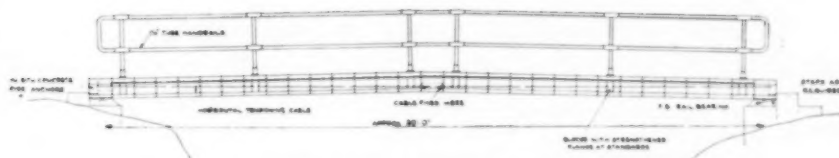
Design for a Prestressed Concrete Footbridge.
